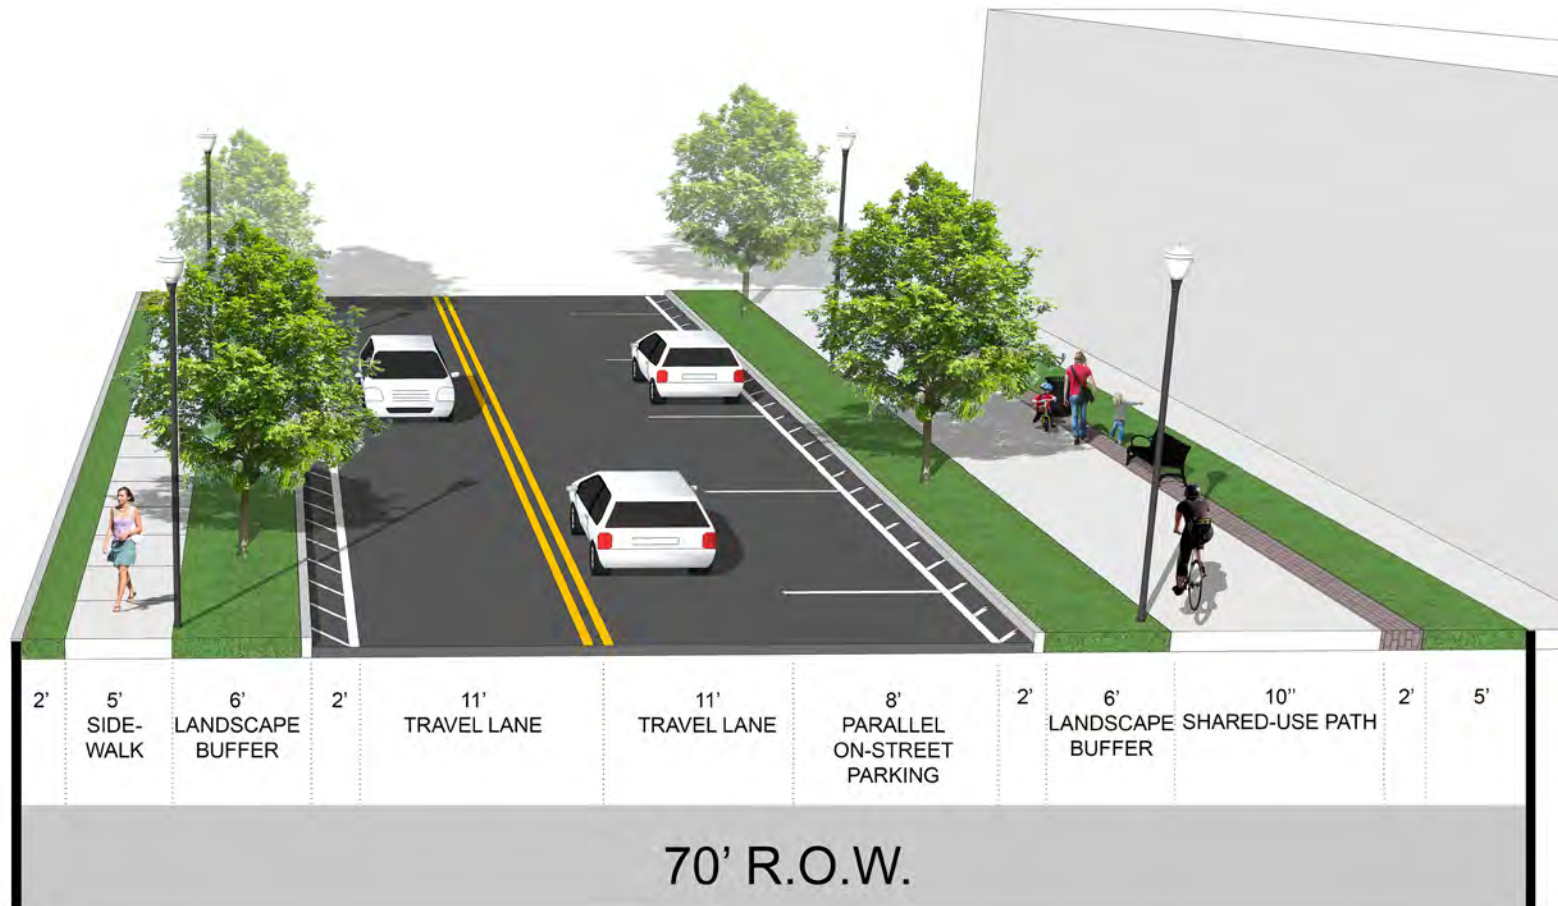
, Jersey Meadows Drive Proposed Street Section
